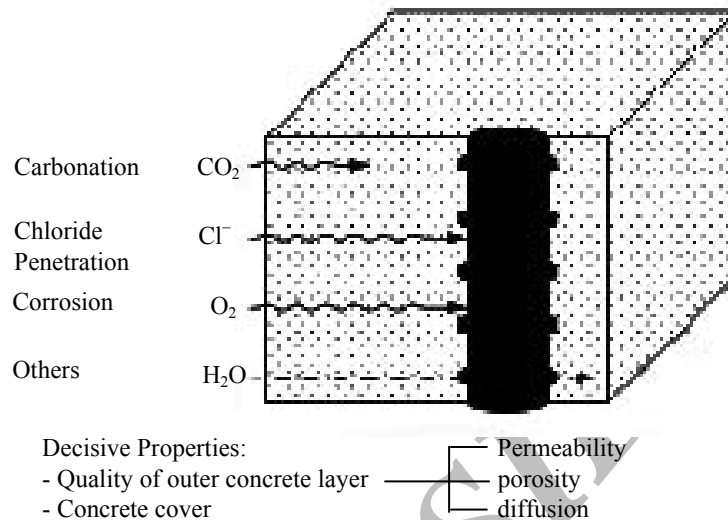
Importance of the penetrability of the outer concrete layer, and the thickness of the cover on the reinforcement to protect the structure against ingress of aggressive substance and deterioration of concrete and reinforcement
